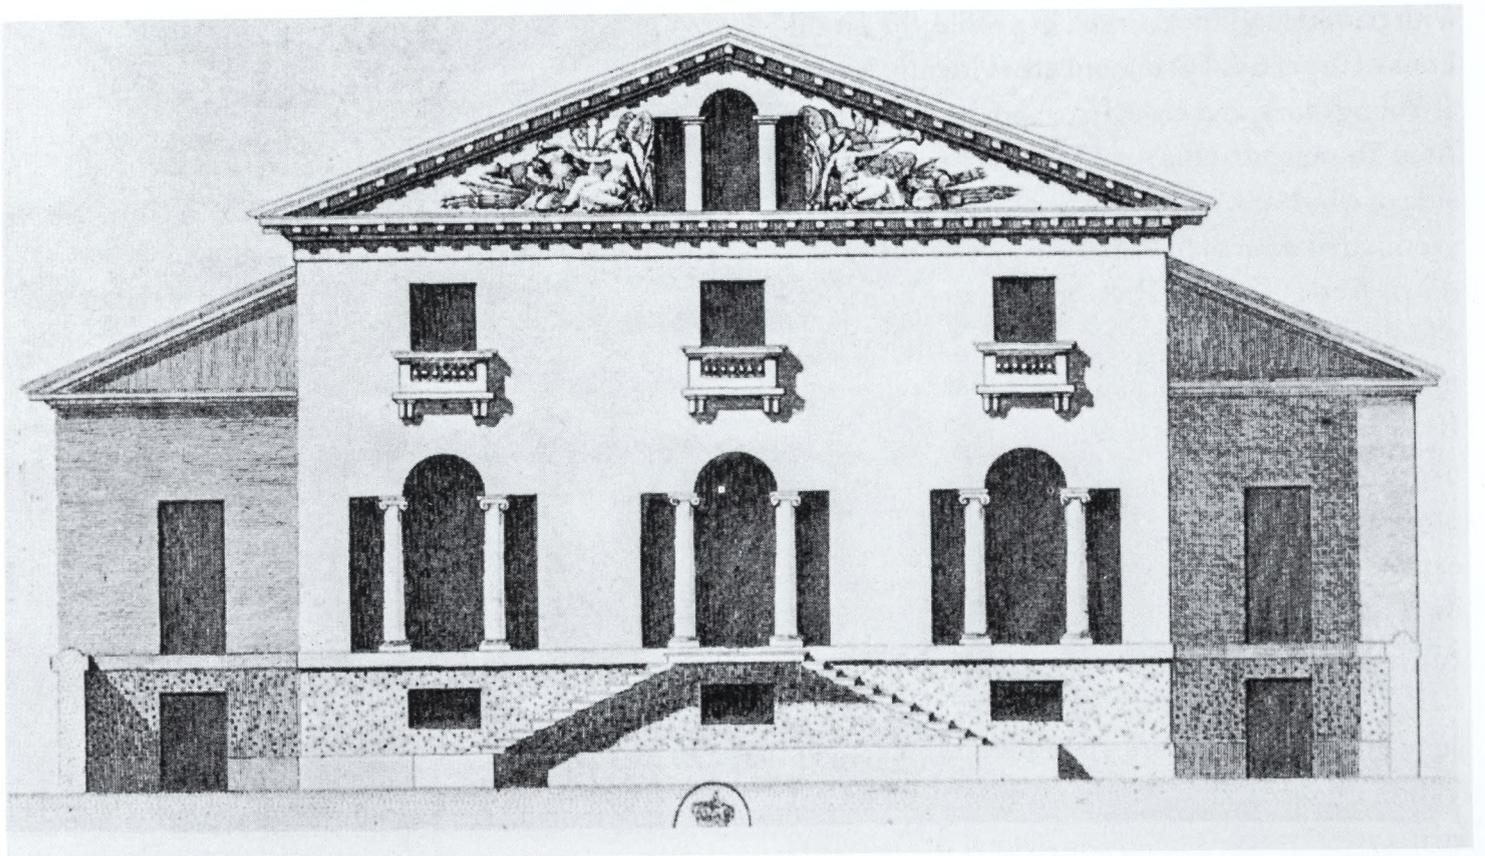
C-N Ledoux, garden elevation of house for J-B Hosten, Paris. *Michel Gallet.
